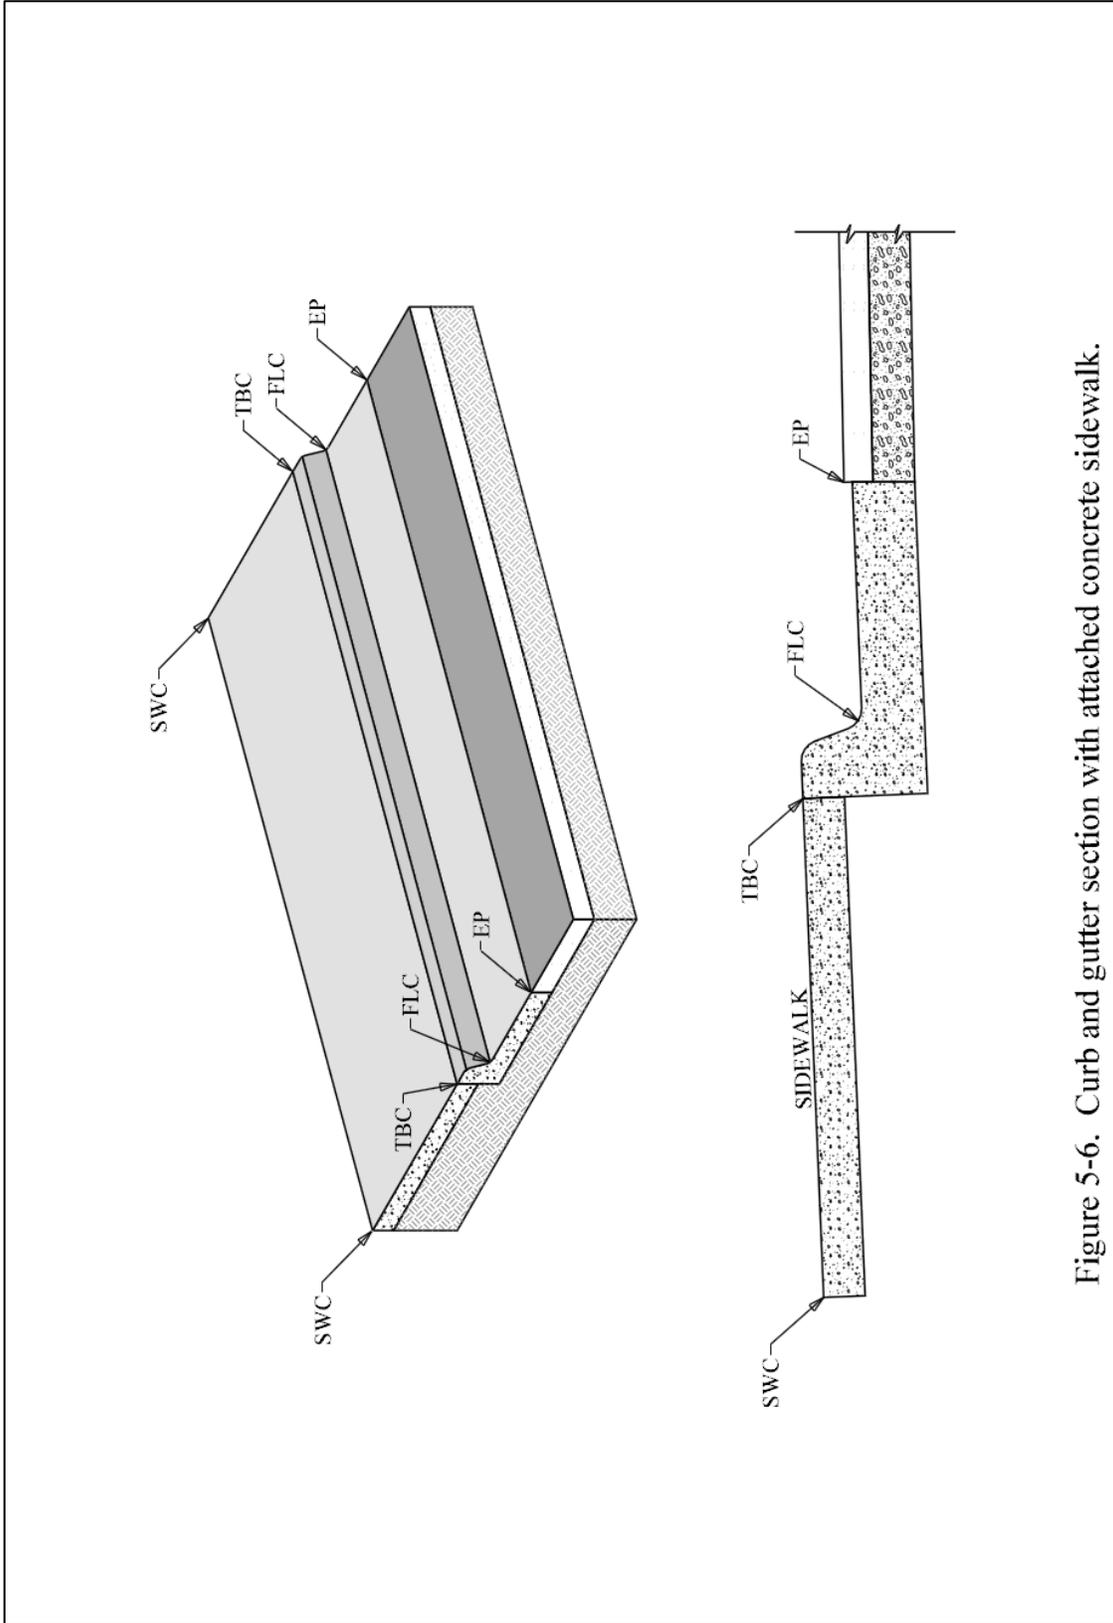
Curb and gutter section with attached concrete sidewalk.
